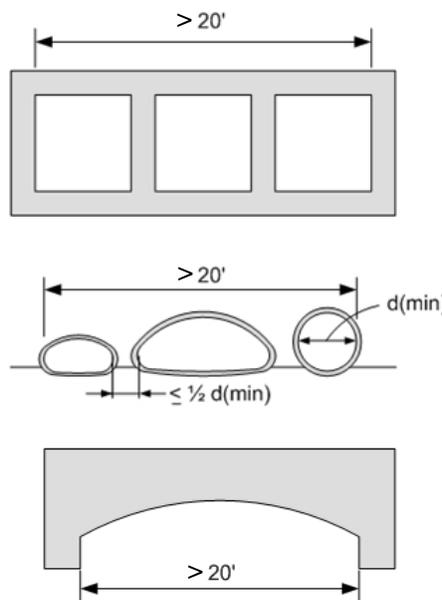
Sketch defining bridge-sized culverts (modified from FHWA NHI 12-049)
